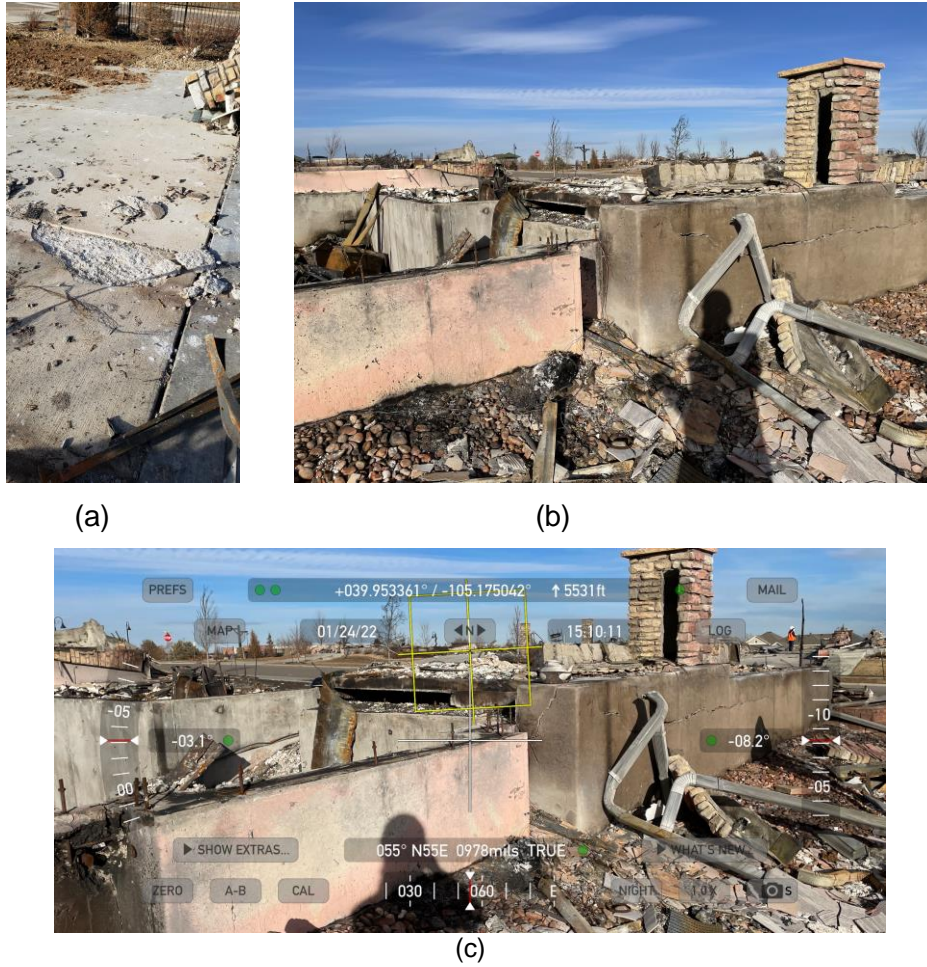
Evidence of elevated temperatures on 8<sup>th</sup> Avenue in Superior (a) concrete spalling, (b) and (c) pinkish foundations of houses
